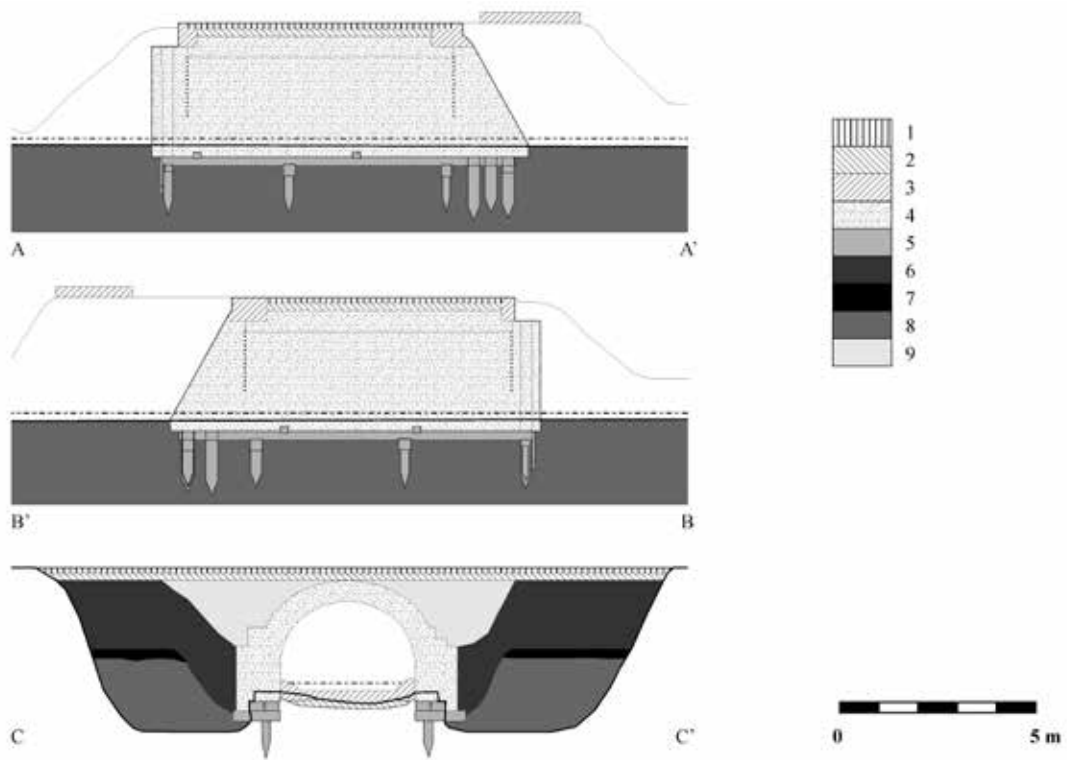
Front view of the right (A-A') and left (B-B') abutments and on the transverse cross-section (C-C') of the bridge. 1 – asphalt road surface, 2 – gravel road base, 3 – concrete, 4 – masonry from sandstone blocks, 5 – wooden structure of the bridge foundations, 6 – brown-ochre sandy soil, 7 – brown to black humus soil, 8 – subsoil, sandy soil to sand, 9 – sandy soil with sandstone stones (source: VMG archive).
